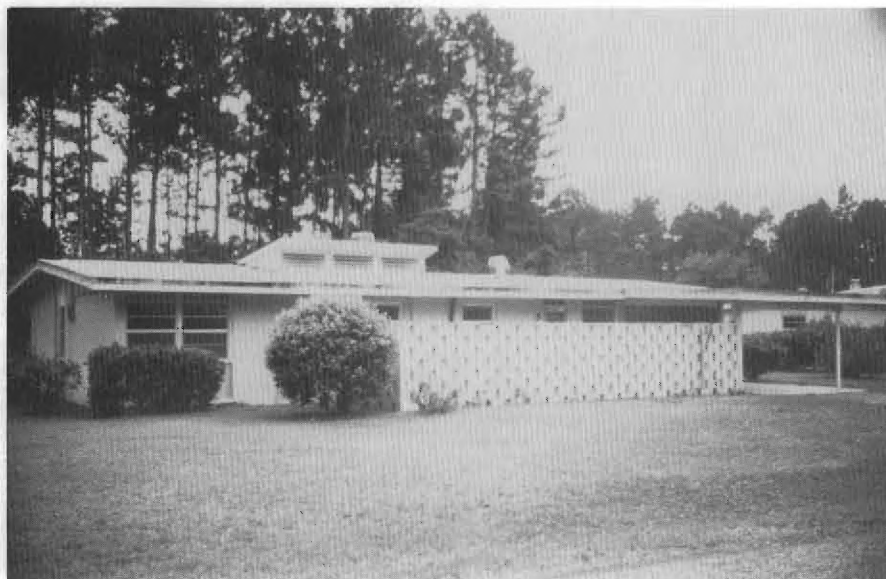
One-Story, Concrete-Block House Typical of Design in Area B-1.
